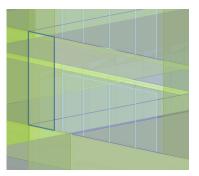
Analytical surfaces model only recognizes walls next to curtain walls and not wall portion above the curtain wall
